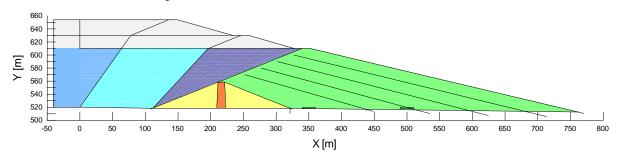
Tailings dam construction to elevation 610 masl (I stage)
